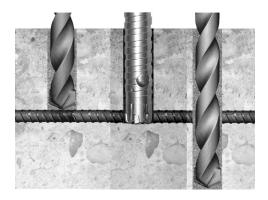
Drilled into rebar (http://championcuttingtool.com/cm79-sds-rebar-cutter.html).
